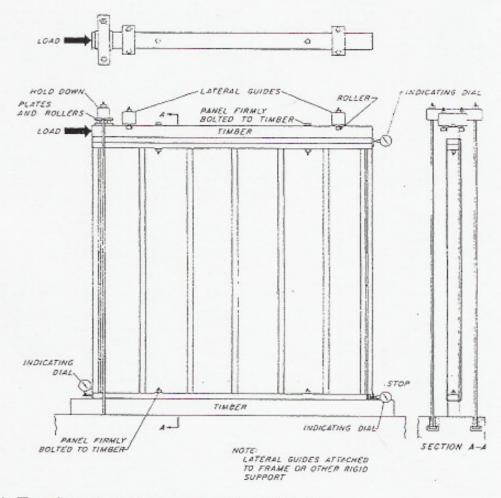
Test Setup for Racking (in-Plane) Loading
